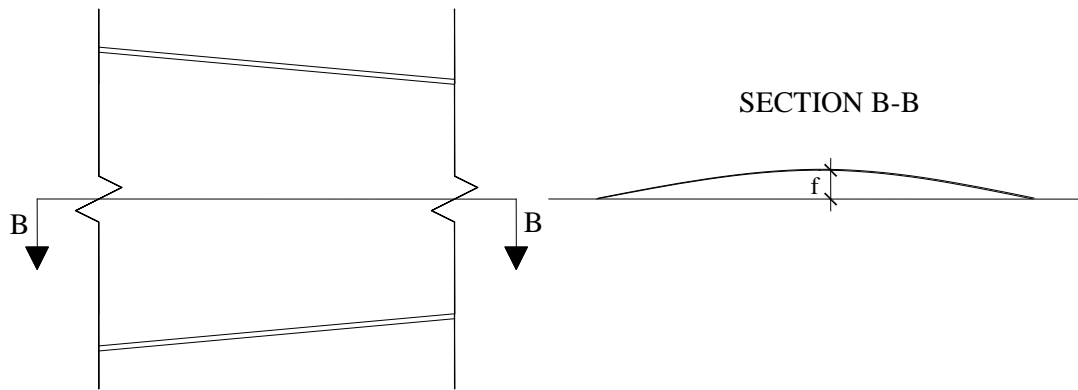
Longitudinal Out of Plane Tolerance
